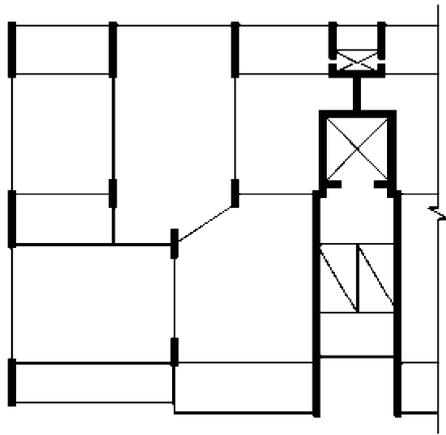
One of irregular shaped examples of Rahmen structure built in the 1970s (bold lines: Korean style column, thin lines: bonded brick wall).
